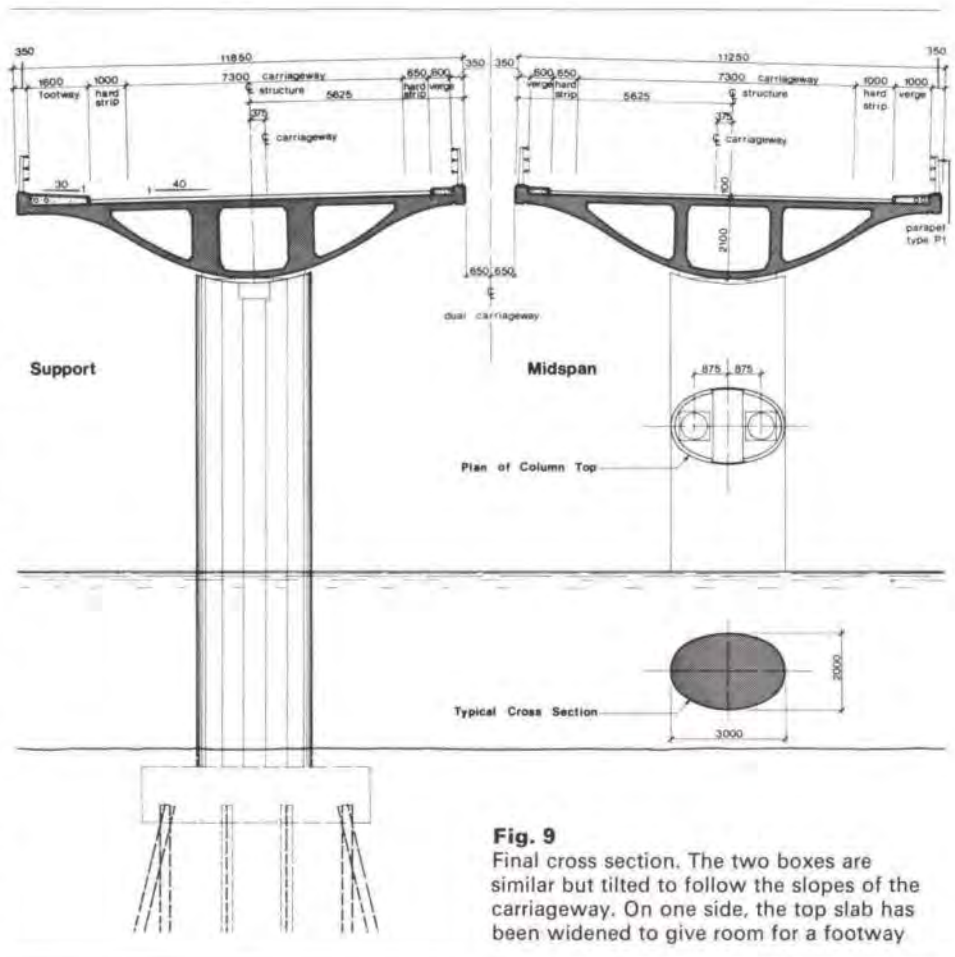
Final cross section. The two boxes are similar but tilted to follow the slopes of the carriageway. On one side, the top slab has been widened to give room for a footway
